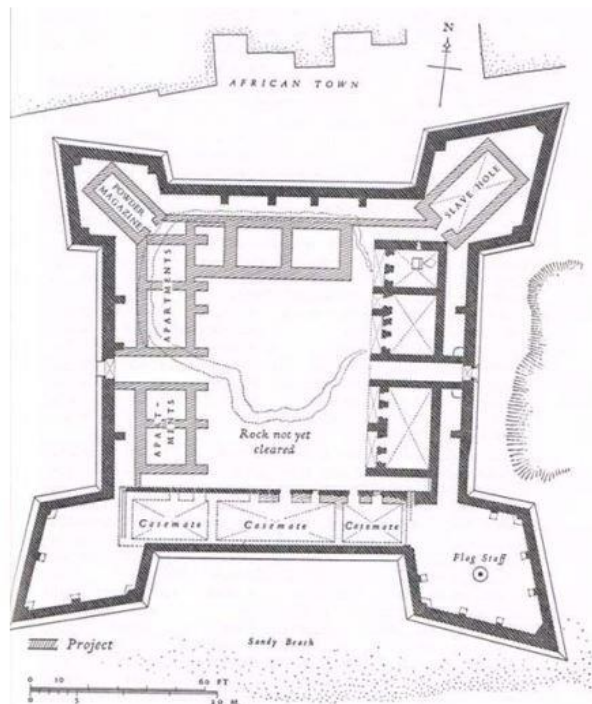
Architectural plan of Anomabo Fort emphasizing the layout plan of the second floor by Justly Watson, March 1756 Anomabo, Ghana⁵⁴
